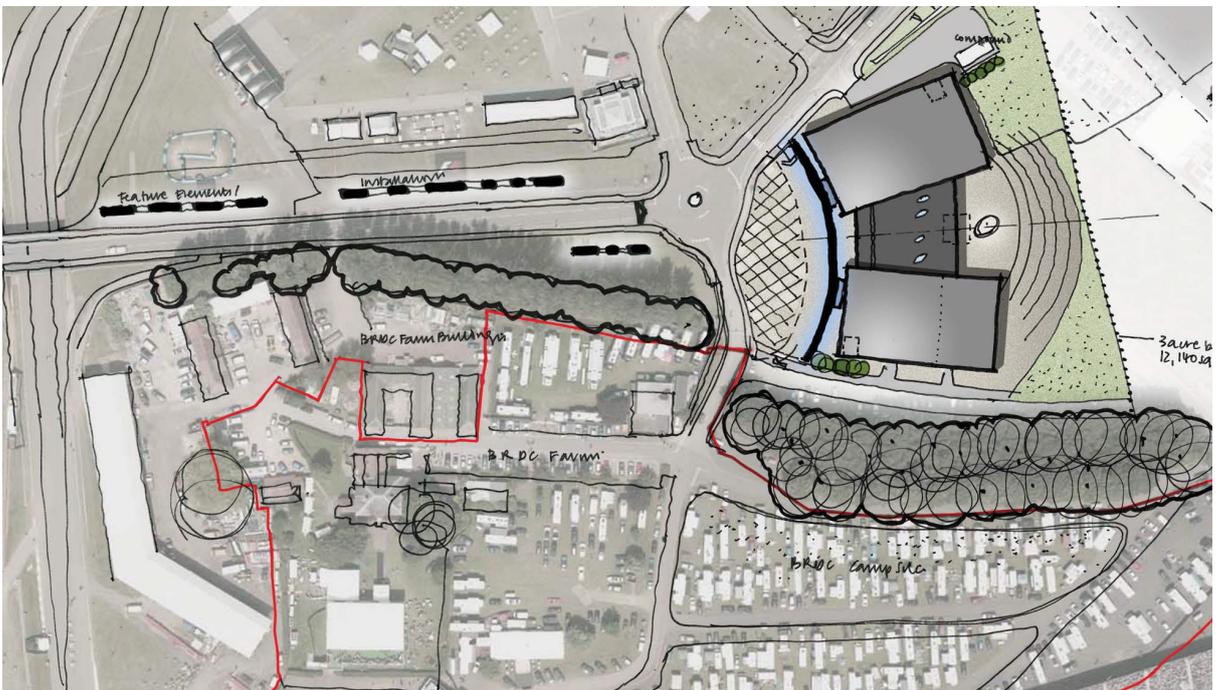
#2 Location. Proposed Location Plan 3rd March 2015
